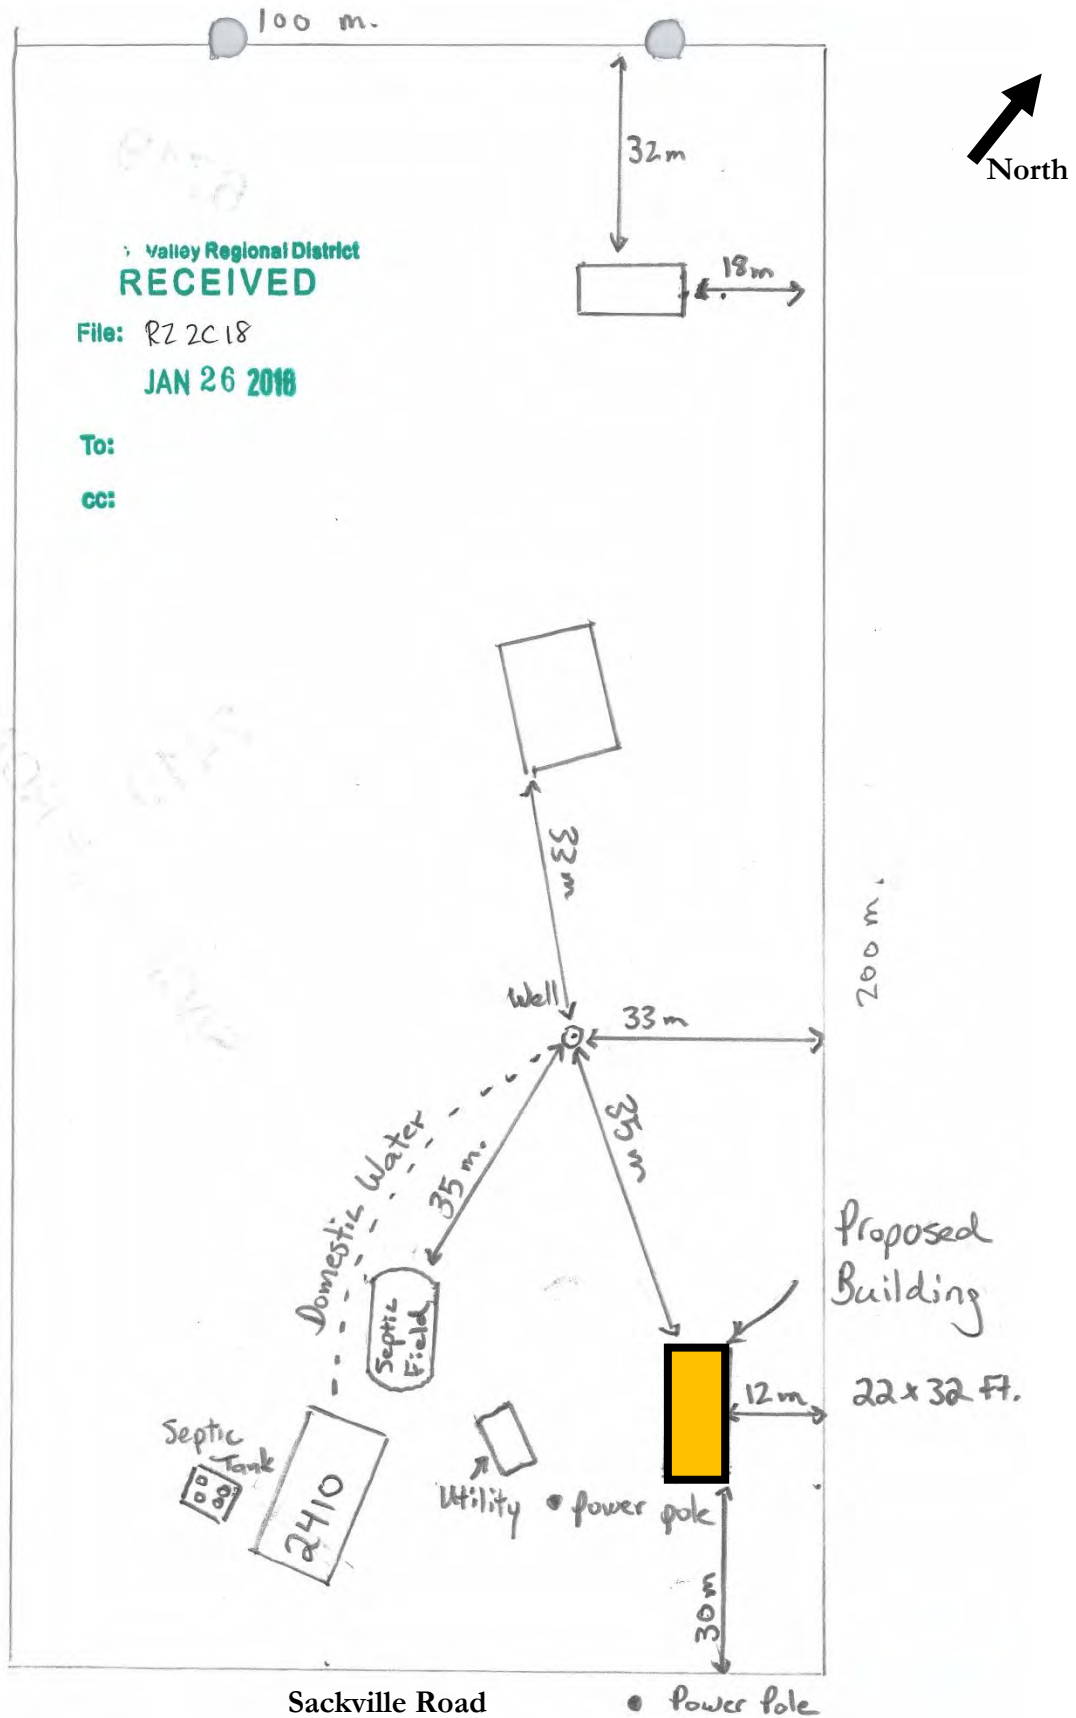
Proposed Site Plan if Rezoning were to be Successful
